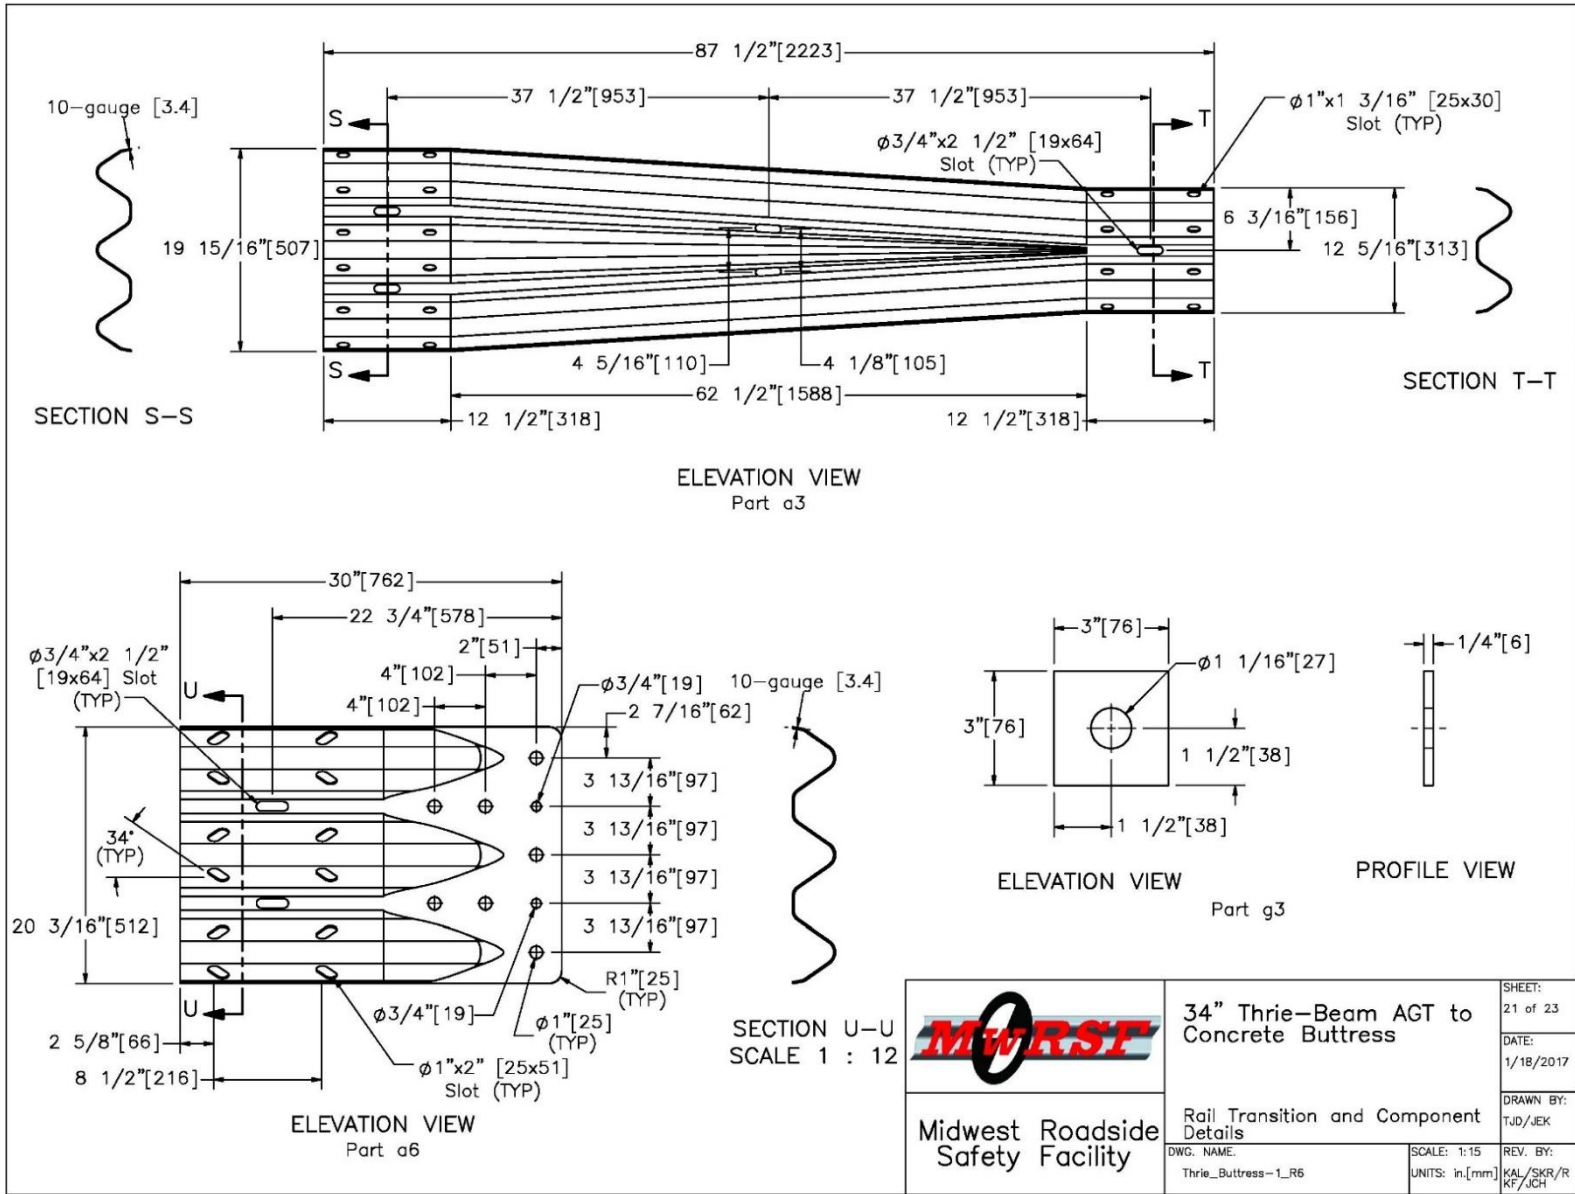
Rail Transition and Component Details, Test Nos. 34AGT-1 and 34AGT-2
